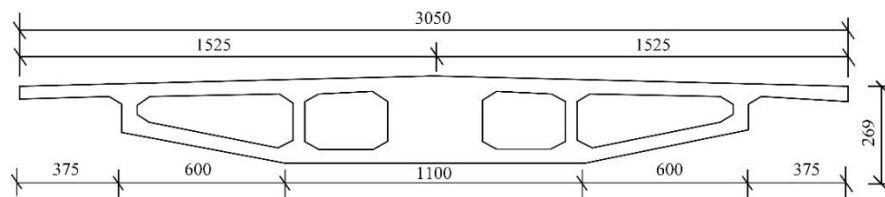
The bridge concrete girder cross-sectional diagram (mm)
